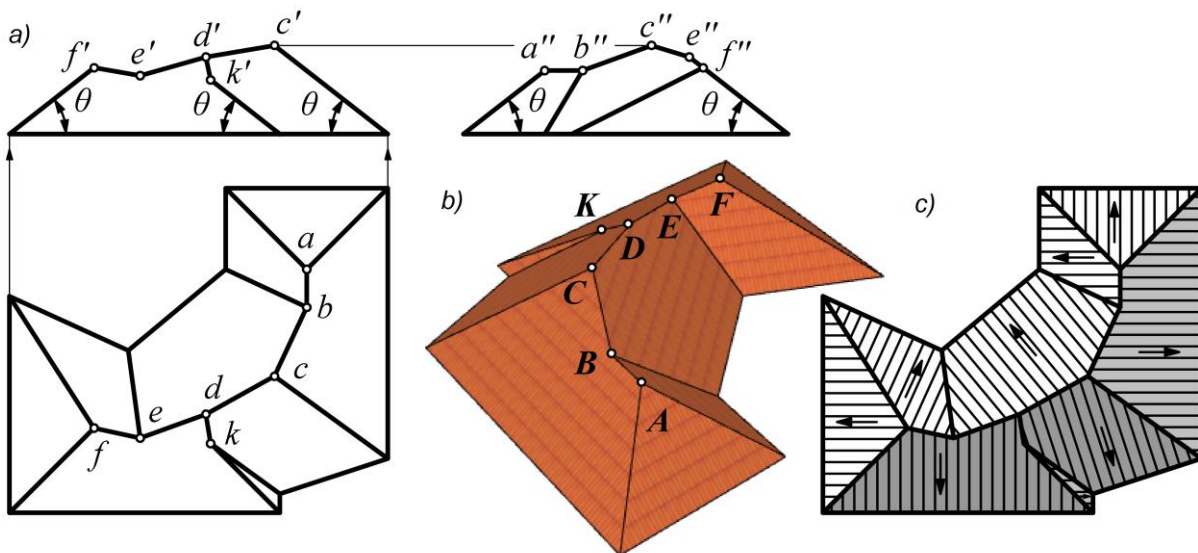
Projections of the roof (a), perspective view of the roof (b) and top view (c)
